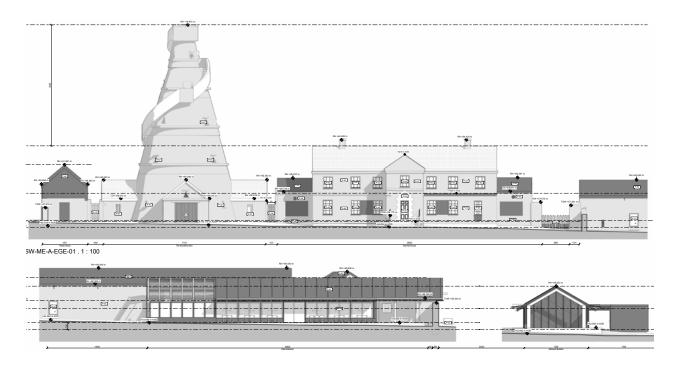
Proposed Elevation 01 by Metropolitan Workshop
